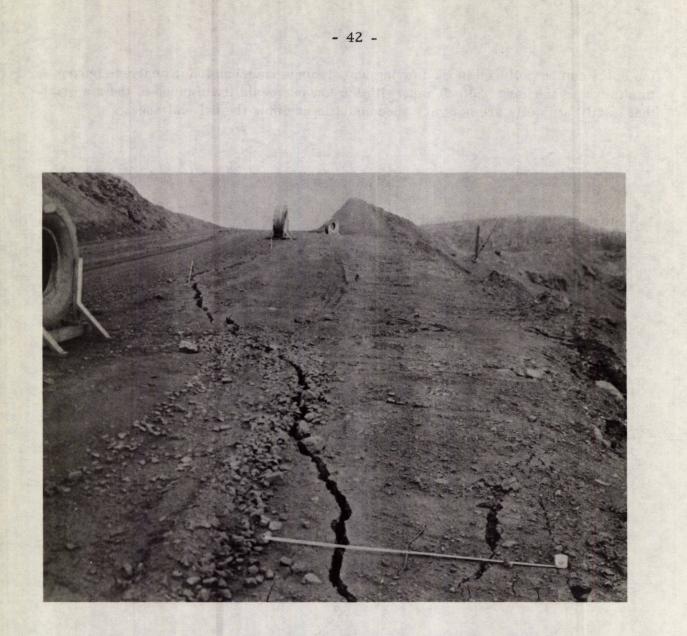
Tension cracks appearing in the crest of the wall in Figure 1, July, 1961.
